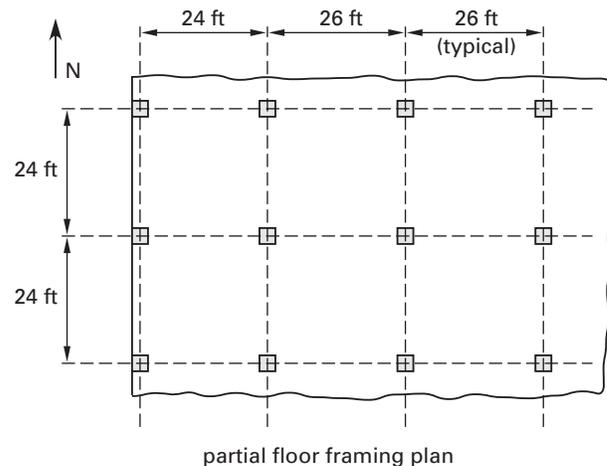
Dimensions in Span Direction of Two-Way Reinforced Concrete Floor Systems
